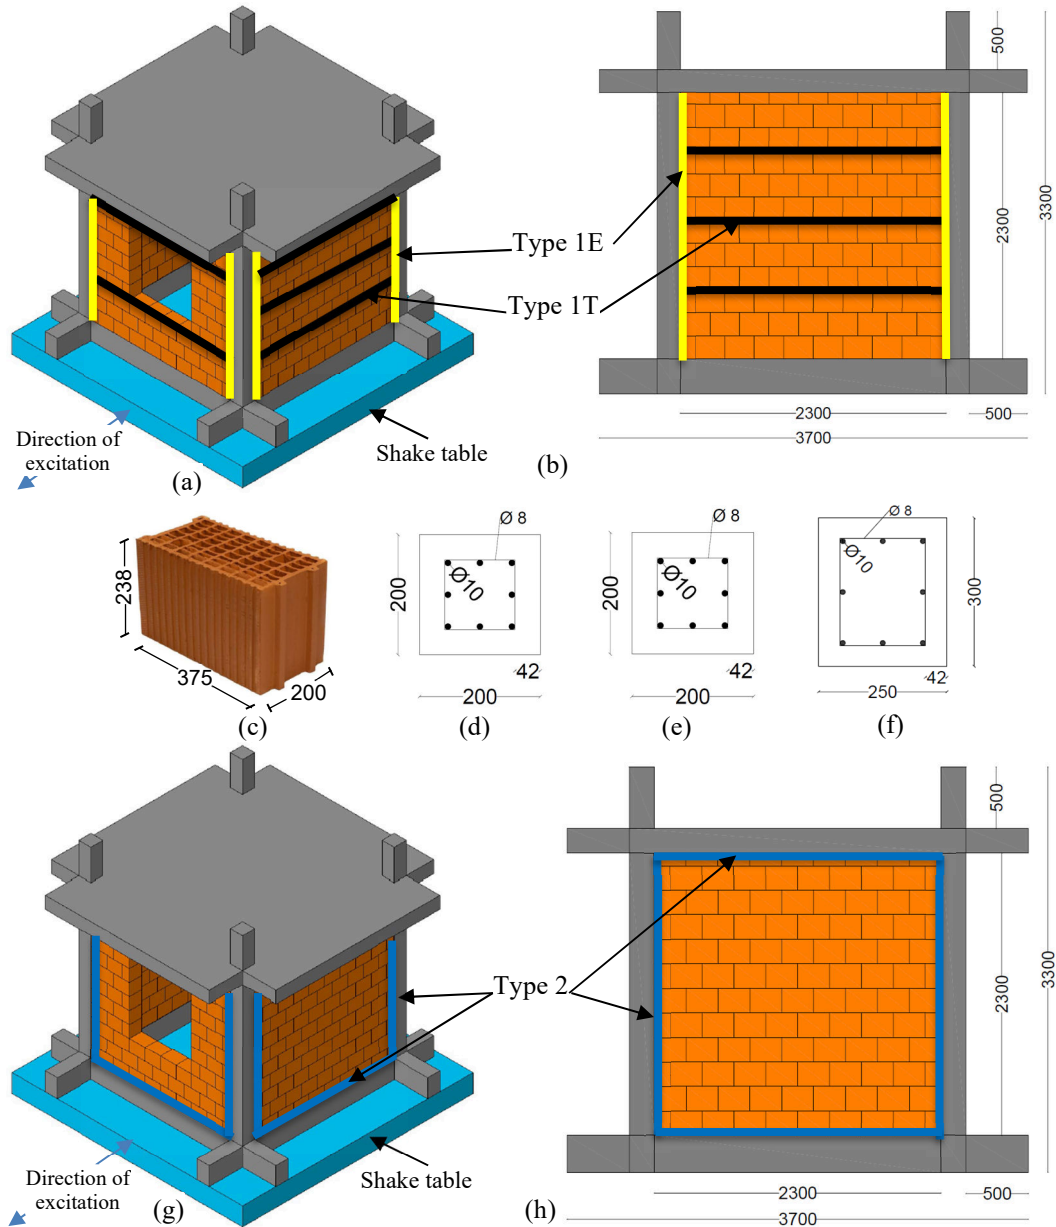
(a, b) 3D view and geometric details with Type 1 joints, (c) masonry unit, (d) column, (e) top beam, (f) top beam, and (g, h) 3D view and geometric details with Type 2 joints. [Dimensions in mm].
